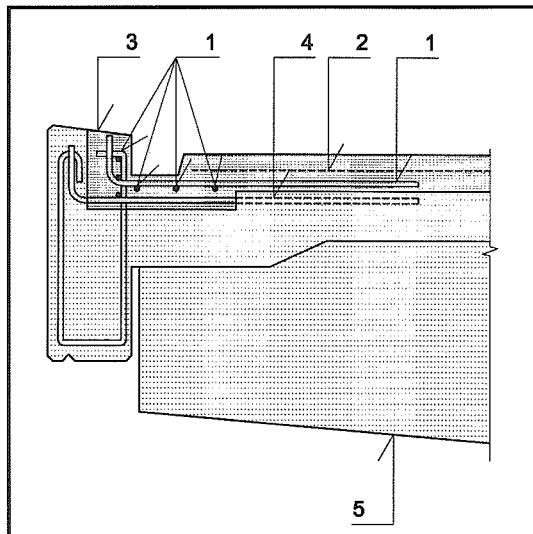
Perimeter Beam And Plank With Surface Scupper Drain
